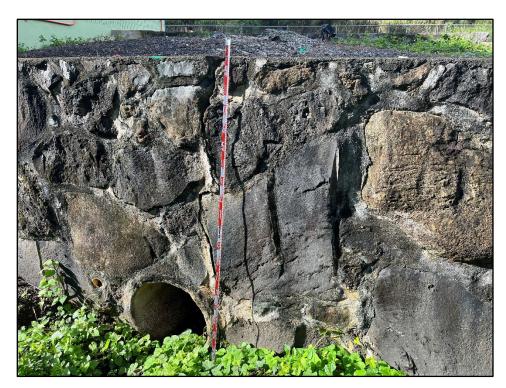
Photo S: Close-up of northeast retaining wall at the Kukanono WWPS facility under evaluation for repair/replacement showing cracking (to left of tape measure), view to southwest
